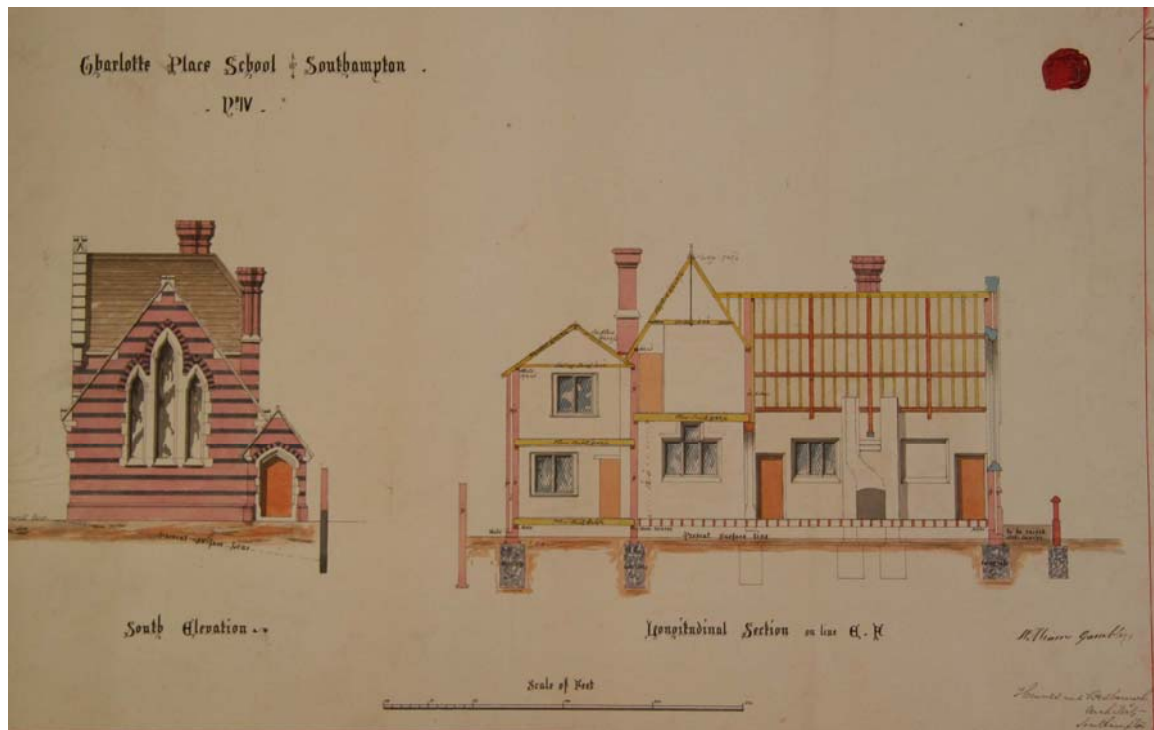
St Mary's (Charlotte Place) National Schools, [1856]: south elevation and longitudinal section
